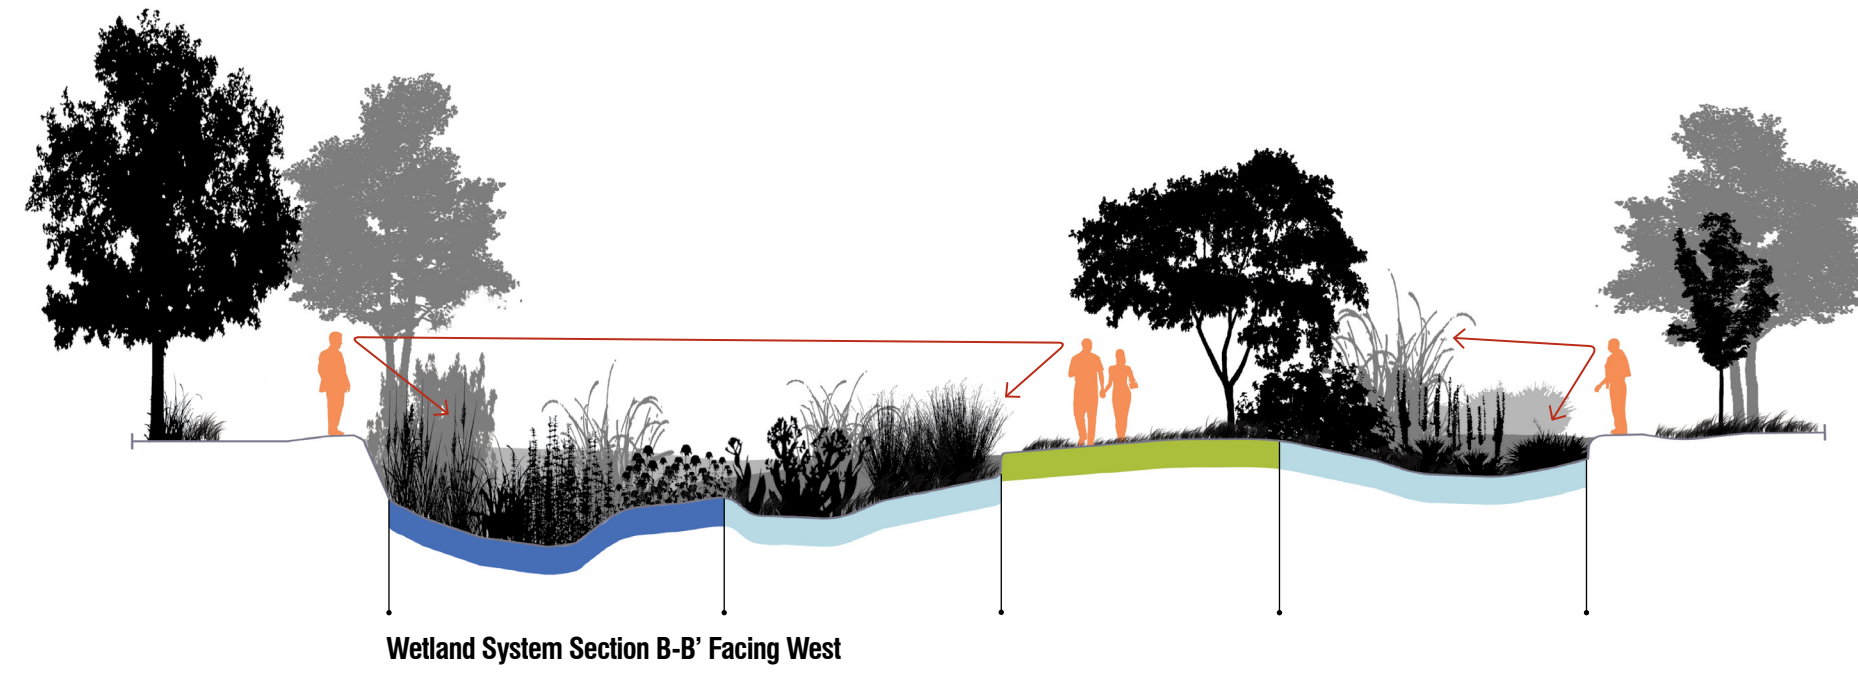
SMS Design #3 - Alternate 4: Constructed Wetland system section facing southwest.
